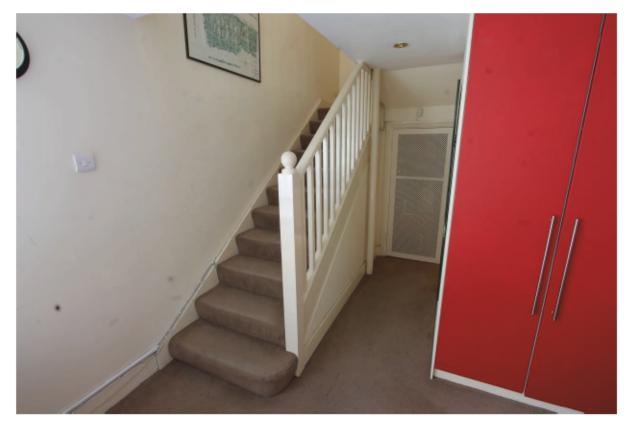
Inserted staircase in Ground Floor Office 2.1 of Unit 2, looking south-east
